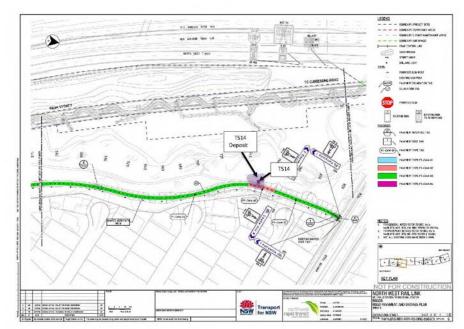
Pavement plan for TS14 archaeological deposit chainage 740-765 type PT-CWW-02 pavemen
